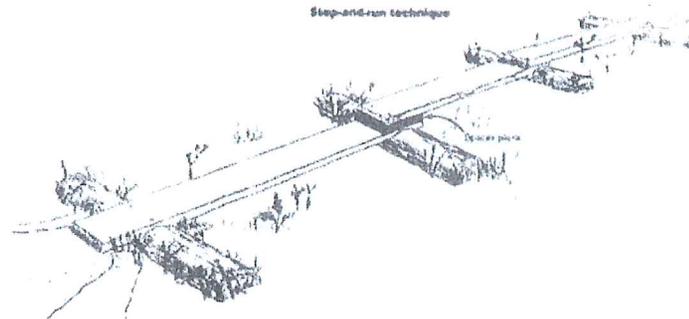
The step-and-run technique is a way of keeping planks level as elevation changes. Level planks help reduce slipping in wet climates.
